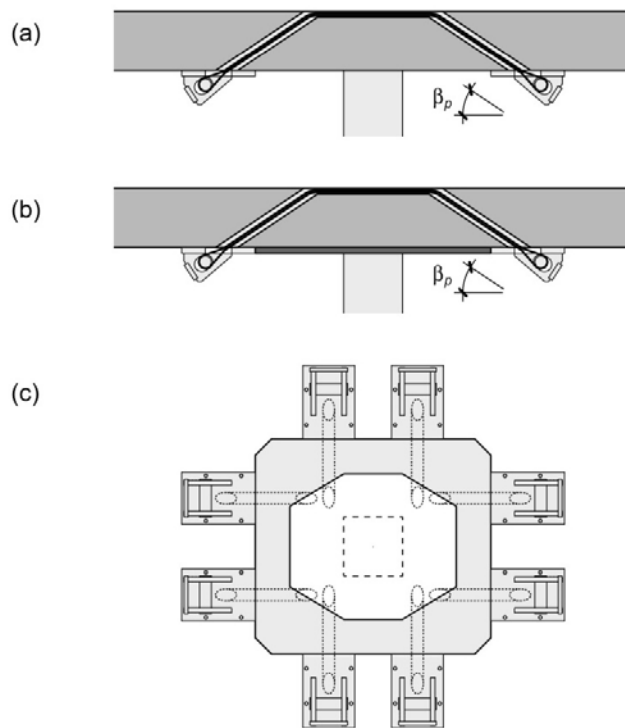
Punching shear strengthening concept with prestressed CFRP straps. (a) Adhesive bonding of anchors with epoxy resin; (b) and (c) steel compression frame as anchor support.
